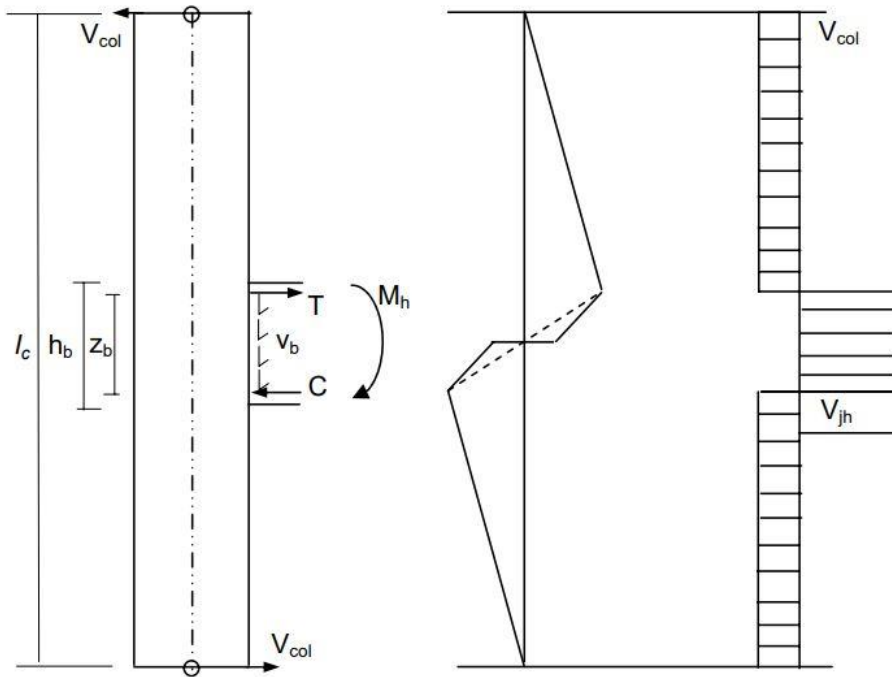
Shear force in exterior joint (Uma and Prasad 2006; Jahan 2016)
